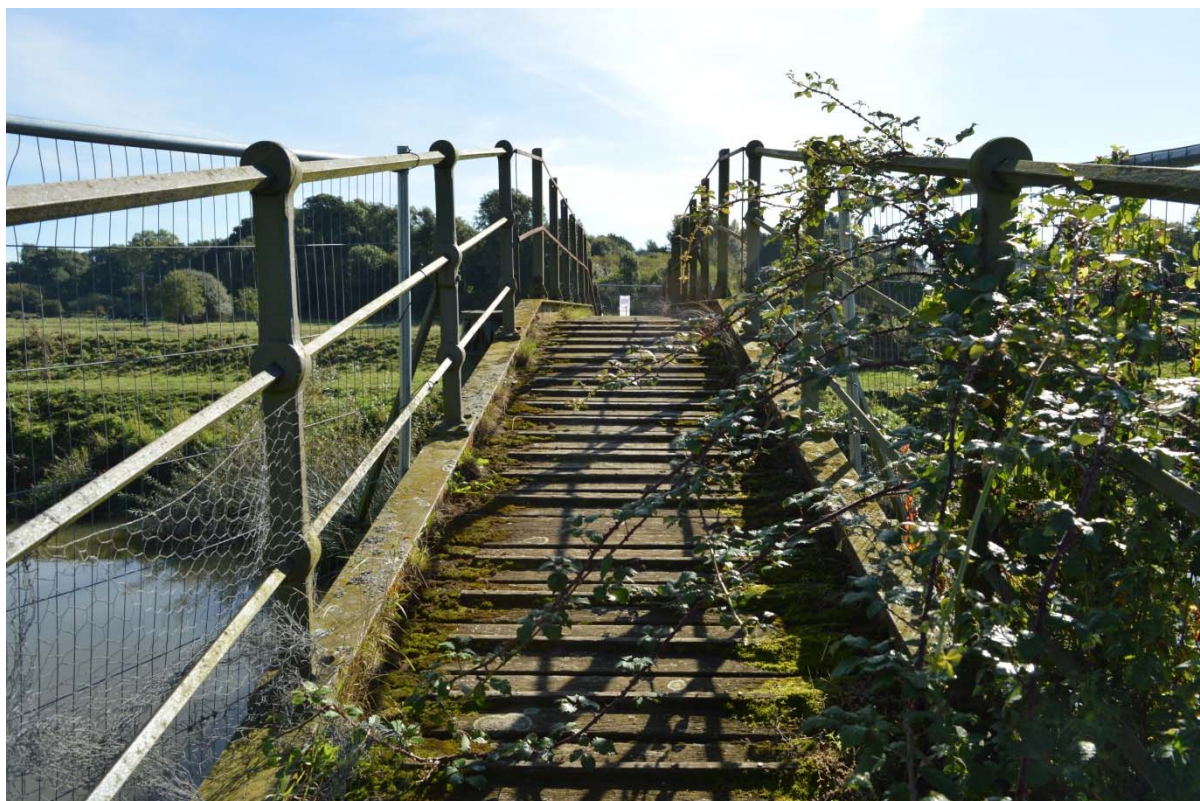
View east along the bridge deck – note the handrails (#EFO16-0067)
